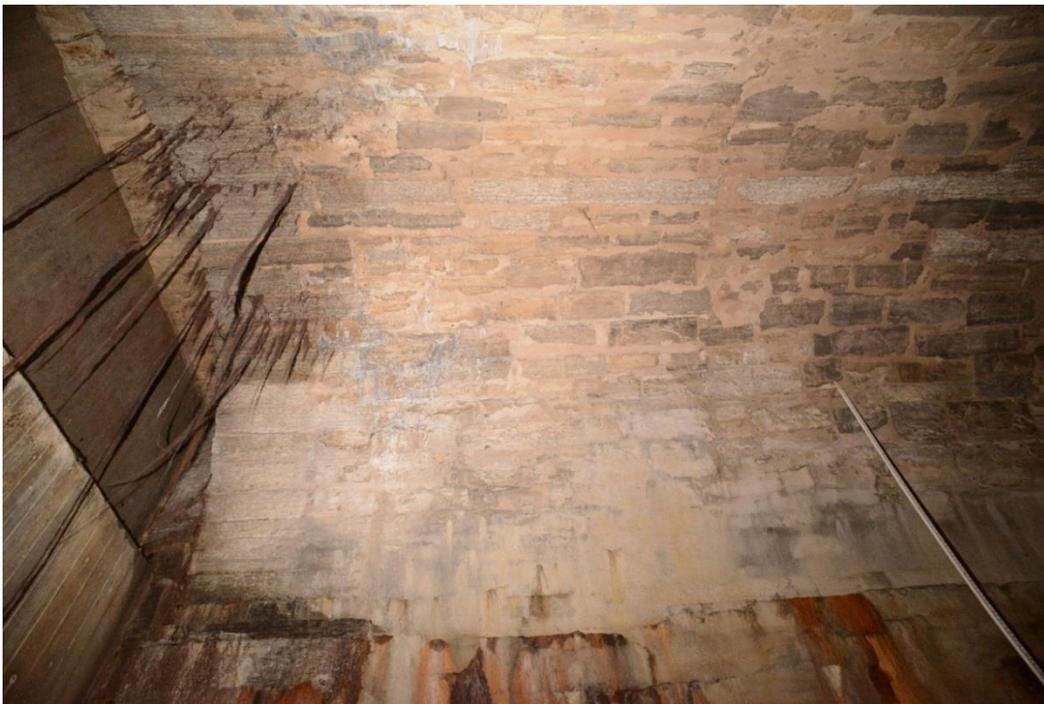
Roots penetrating through arch roof in front of bulkhead. Photograph by CNA Engineers, Inc., January 2014.
